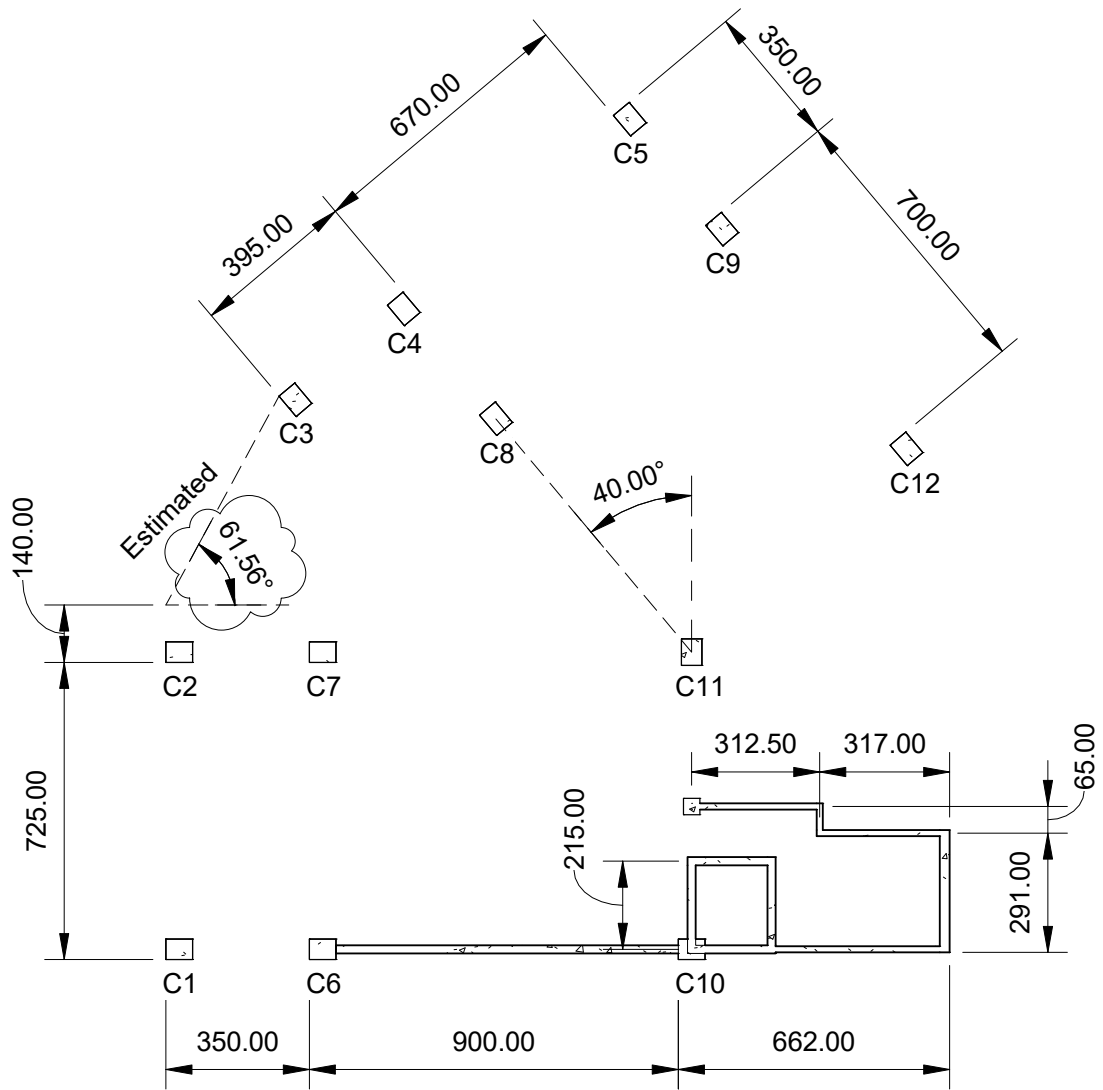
Column Layout Reproduced from Original Construction Documents [cm]
